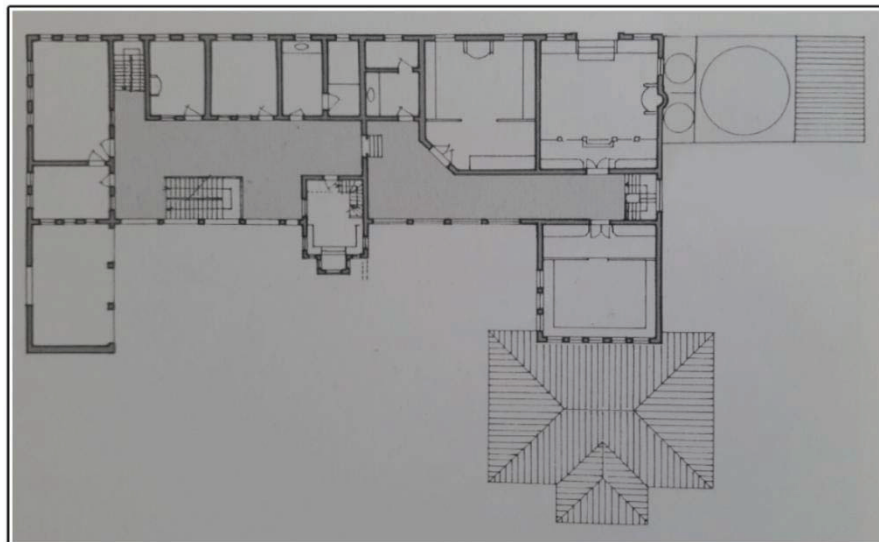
18<sup>th</sup> century house: First floor plan of the house in Vezir Köprü.
